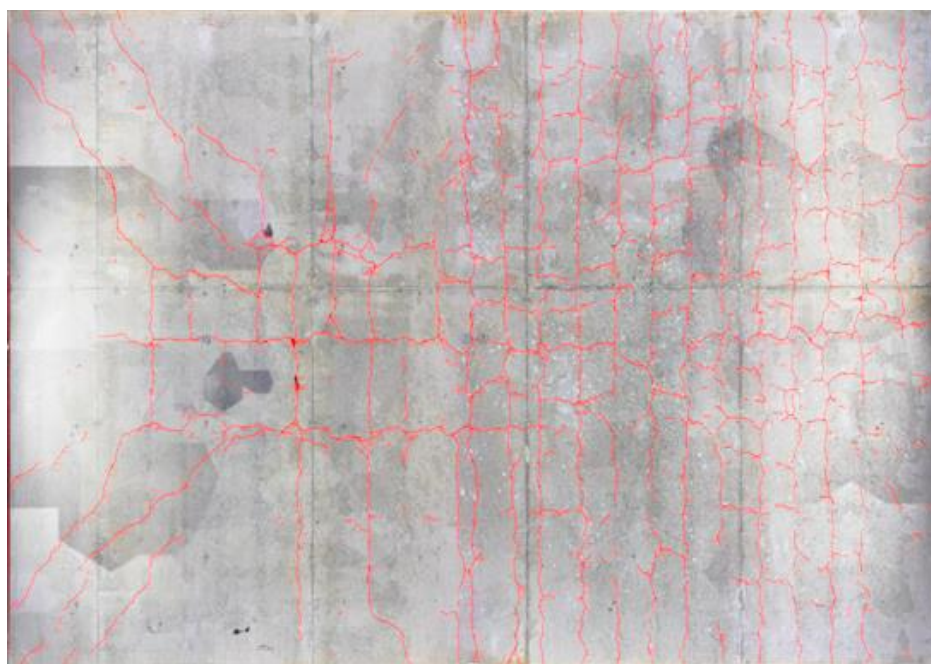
Crack pattern on the bottom of the RC slab specimen after the test on the wheel running machine (red lines: cracking)
